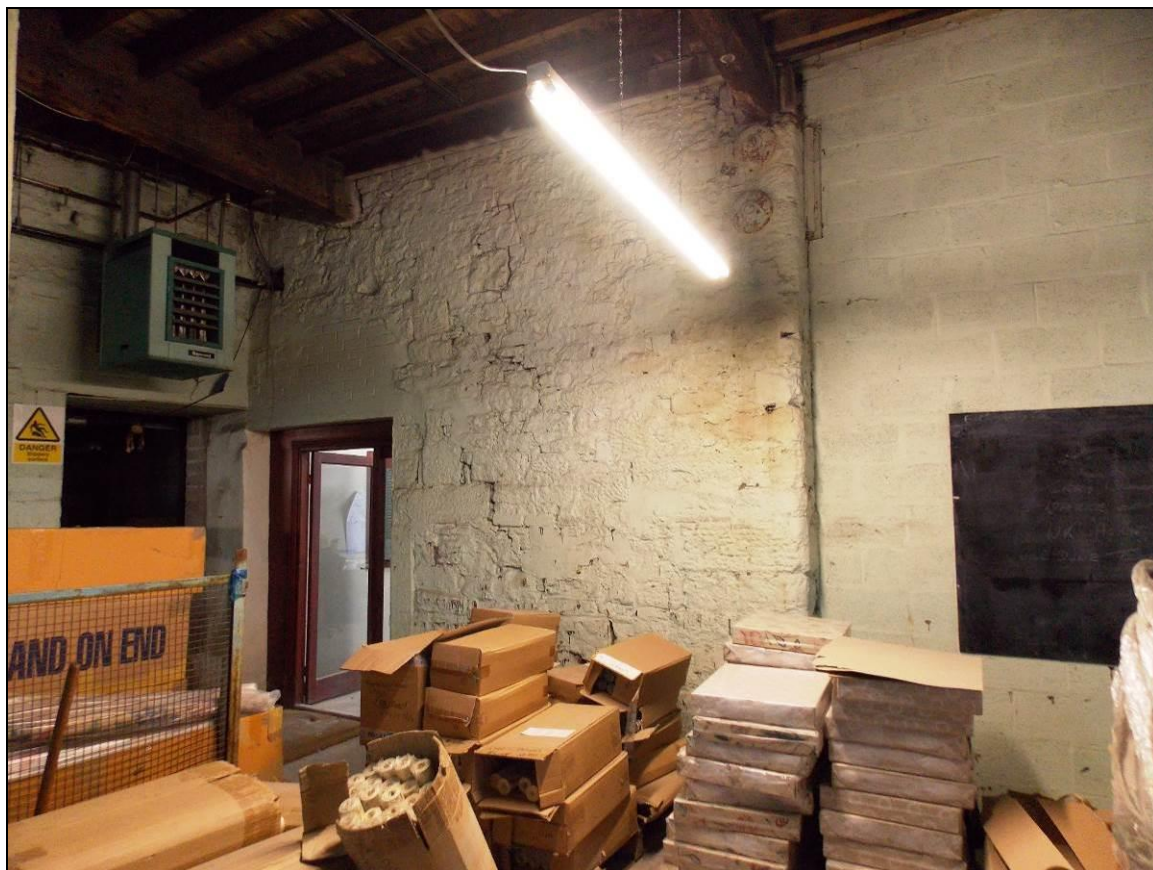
Stone wall and doorway to Building 4, looking south-west.
